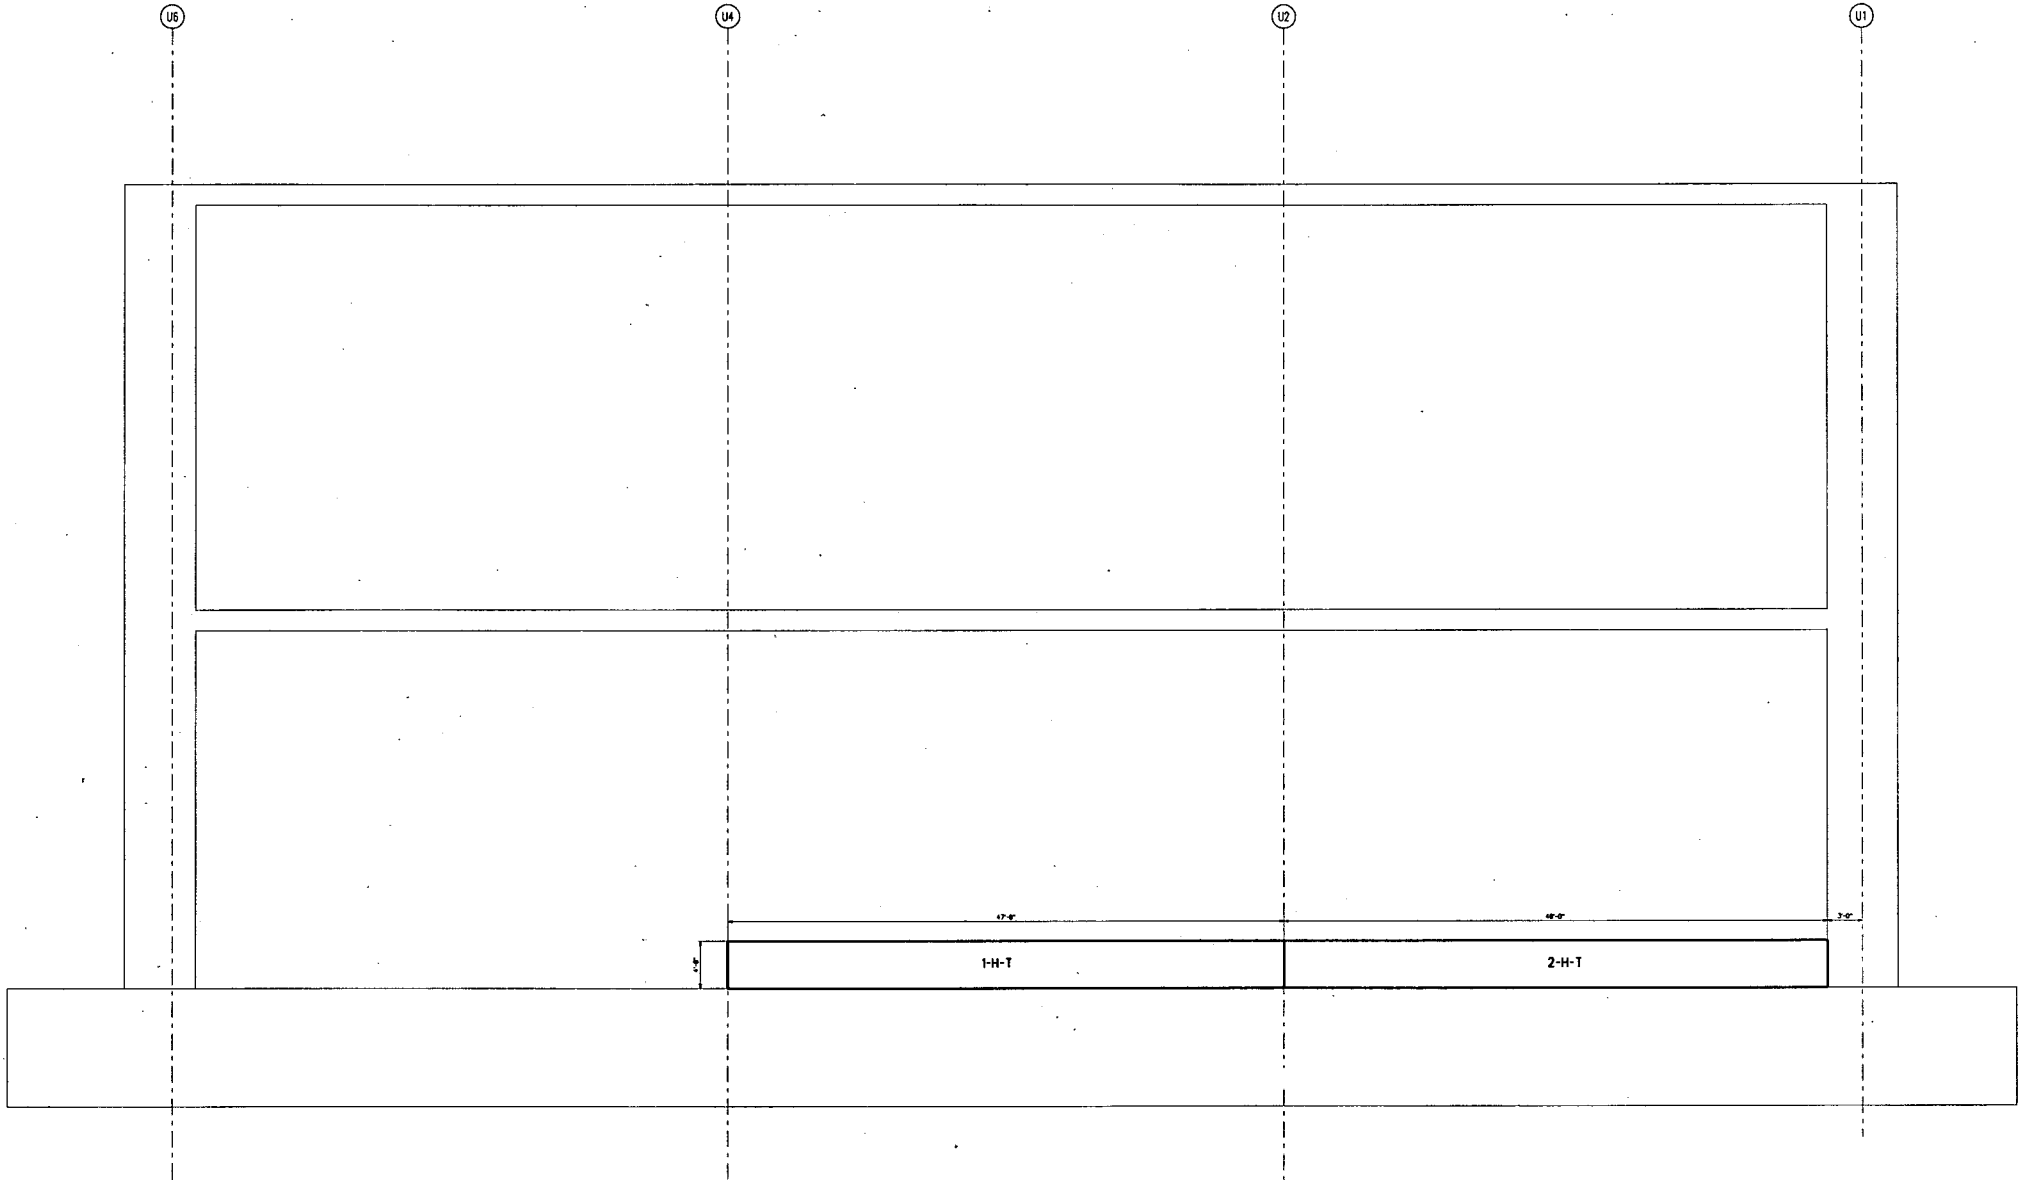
H.6-56: PUMPHOUSE NORTH WALL LOOKING SOUTH
